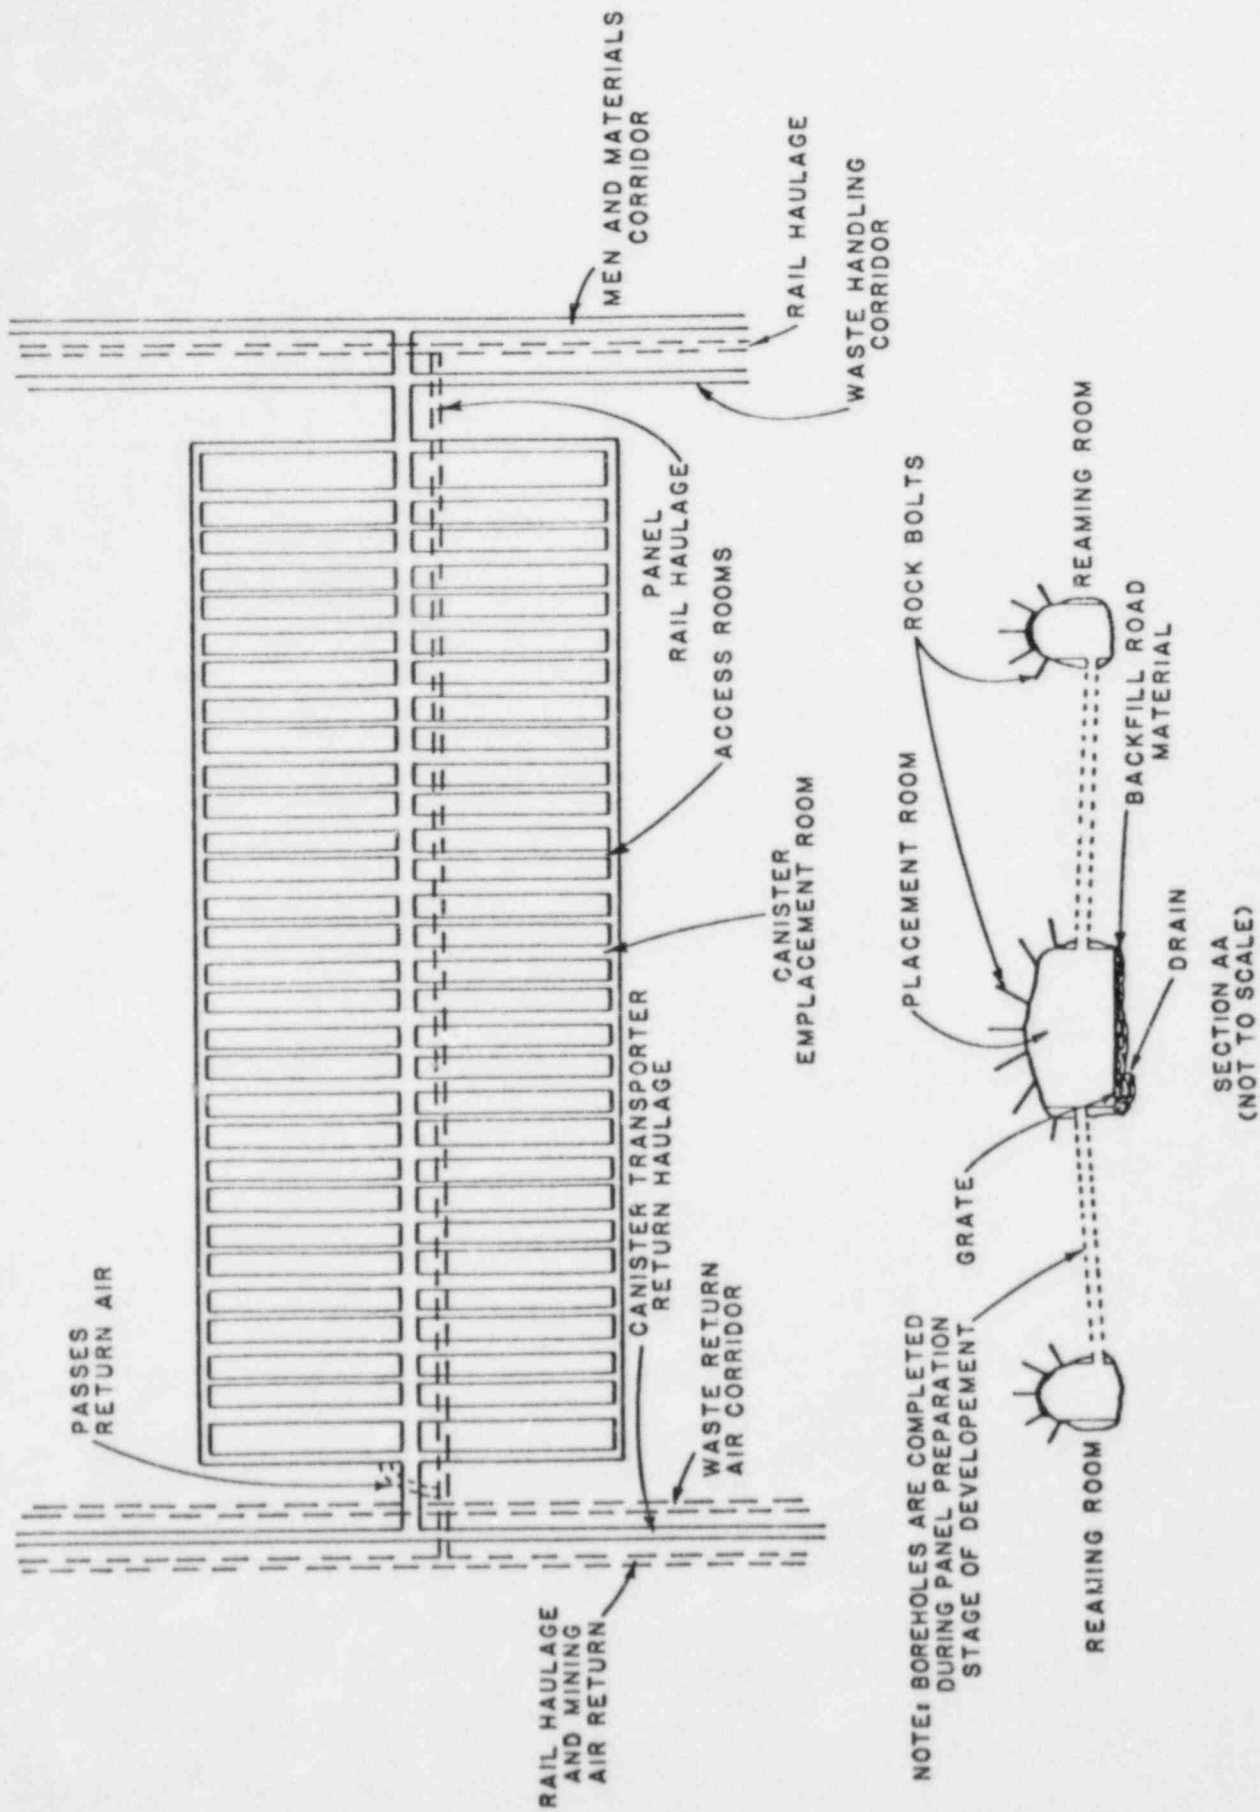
Panel and room layout for storage in horizontal holes.
